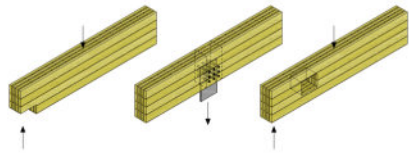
Cross-laminated timber beams are less susceptible to cracking since cross-layers oriented orthogonally to the beam axis take effect of reinforcement
